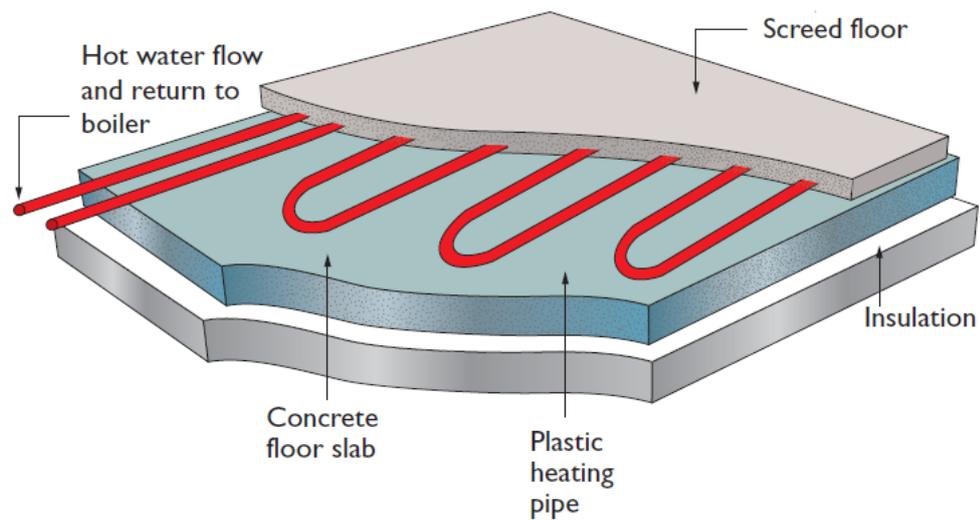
Water Based Underfloor Heating (Source www.bsria.co.uk)
